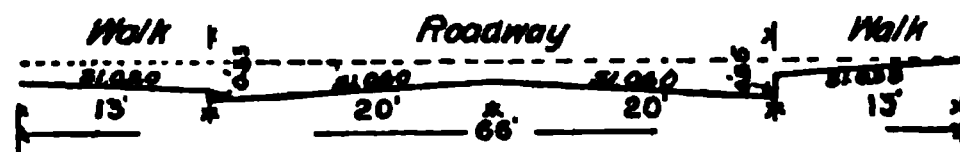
CROSS SECTION OF SIDE-HILL STREET.
